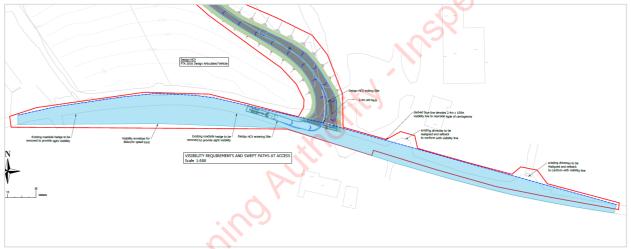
Access junction with Scrouty Road. Drawing Ref: 24052-DR-0103_issue PL01 - Kilgallen & Partners
